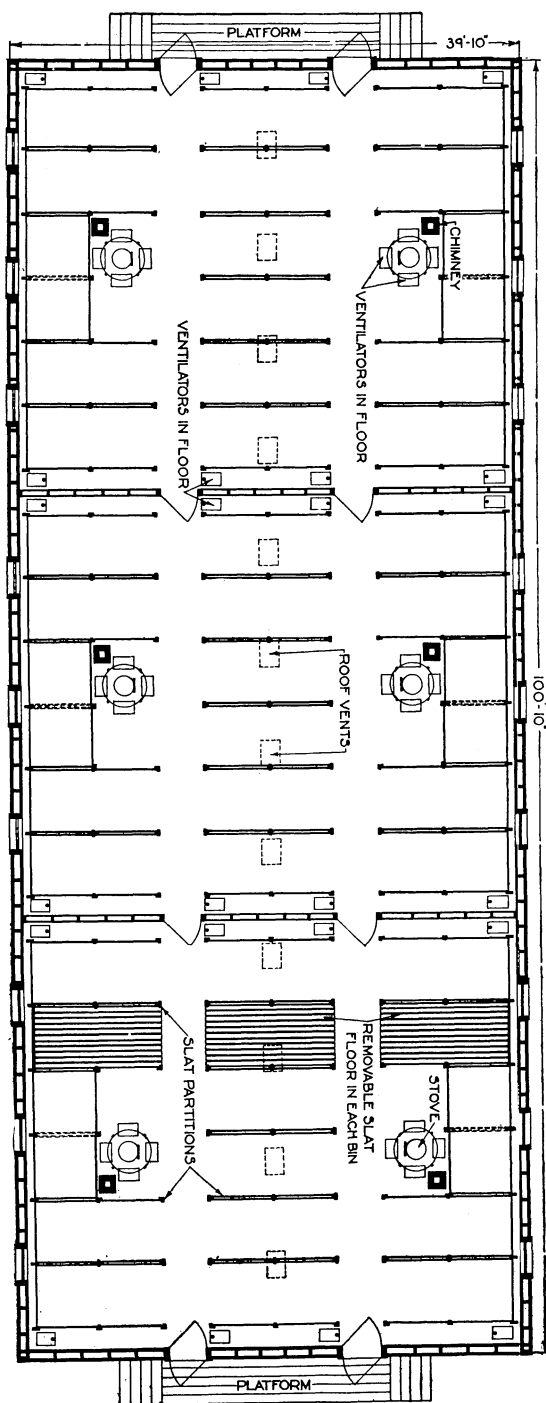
Floor plan of a sweet-potato storage house, size 39 feet 10 inches by 100 feet 10 inches, having a capacity of 12,000 bushels in crates or 15,000 bushels in bulk
